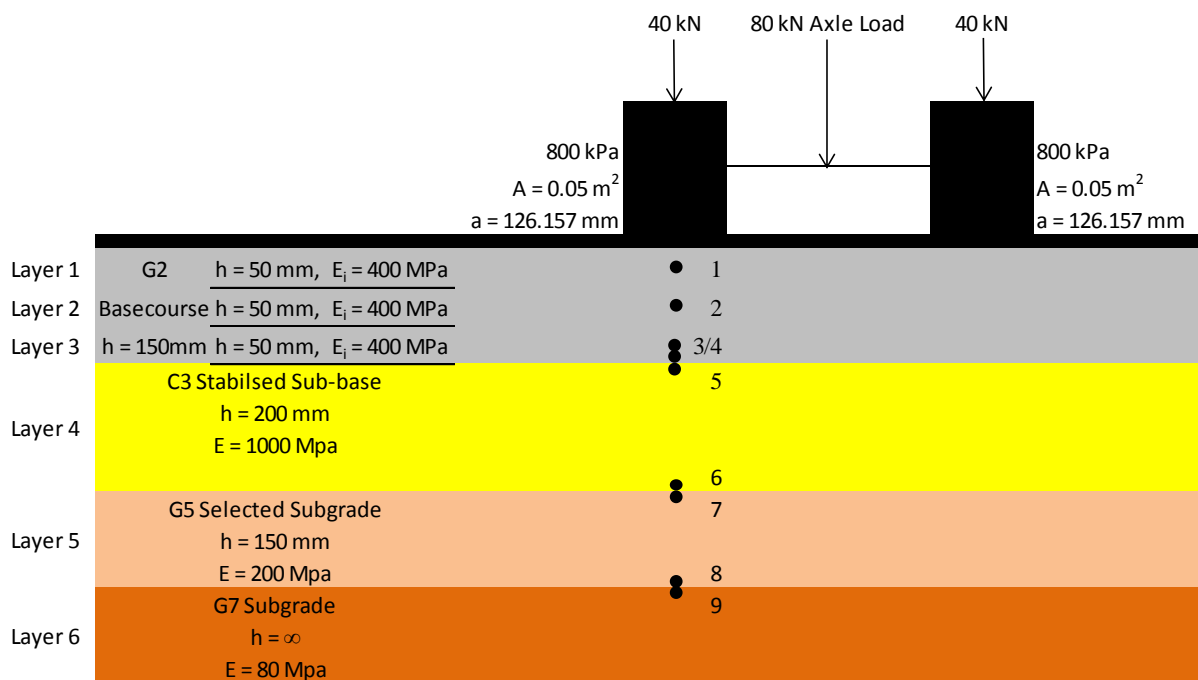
1: Pavement Structure and Load Layout used in Stress-Strain Analysis
